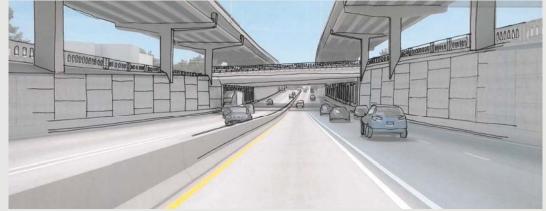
East/West Crossing, Retaining Wall, and Barrier Improvements, Decks Section
